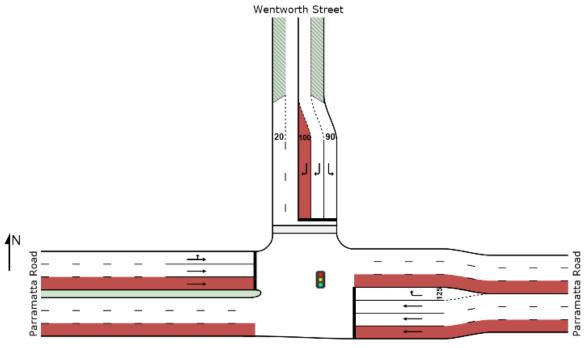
Intersection of Parramatta Road and Wentworth Street
